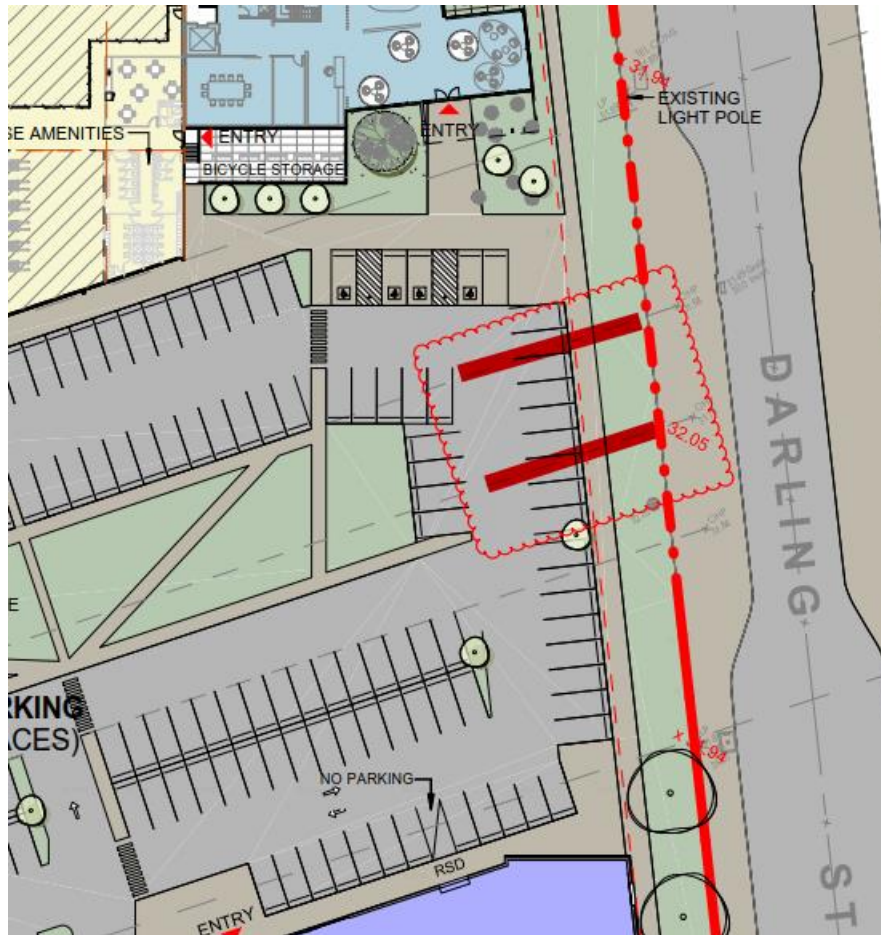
Preliminary Site Layout Plan with Clouded Minimum Ground Clearance Area
